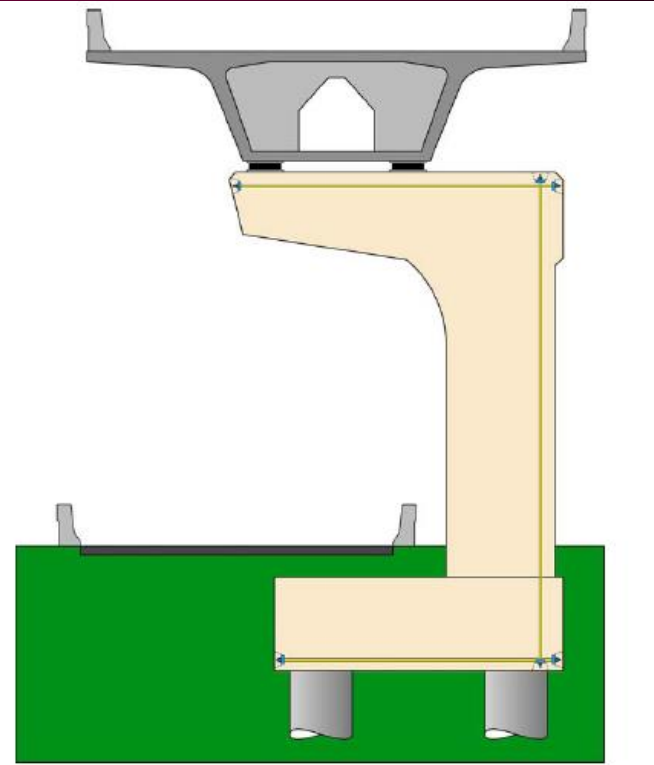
Post-Tensioning in Cantilever Piers.
